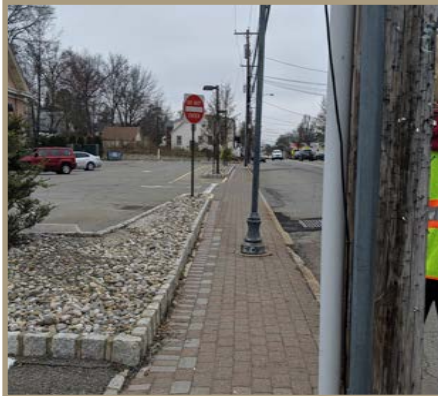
Narrow and cluttered sidewalk, looking northward on North Beverwyck Road.
